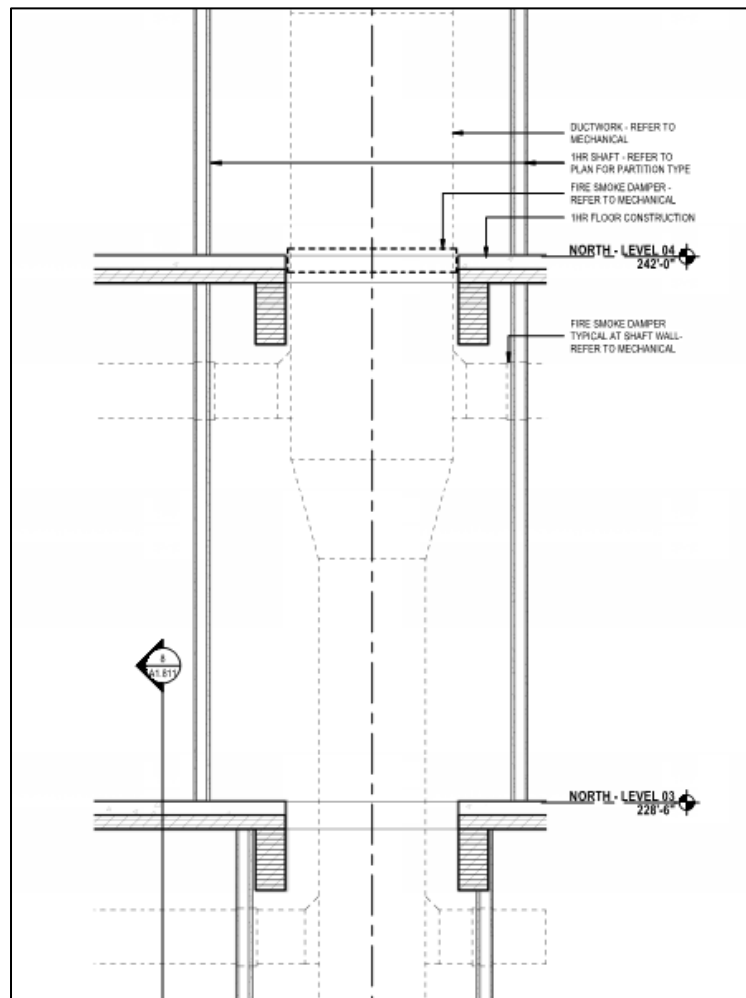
Vertical section through shaft at horizontal assembly between Floors 3 and 4.
